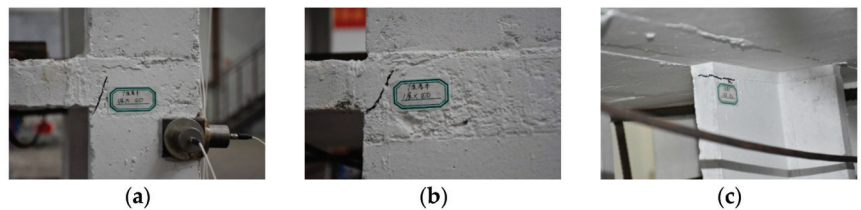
Damages after excitations of the moderate level of intensity 7 (Phase II): (a) a crack at a slab-wall connection; (b) another similar crack; (c) a crack on an L-shaped wall.
